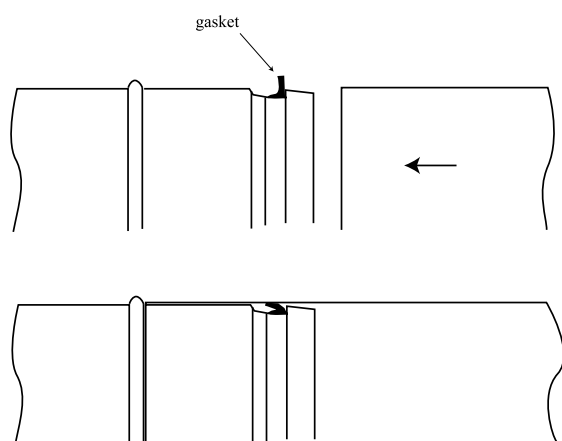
Pre-fitted sealing gaskets for circular ducts. Airtight rivets or plate-screws may be necessary to ensure the mechanical stability of the joint.
